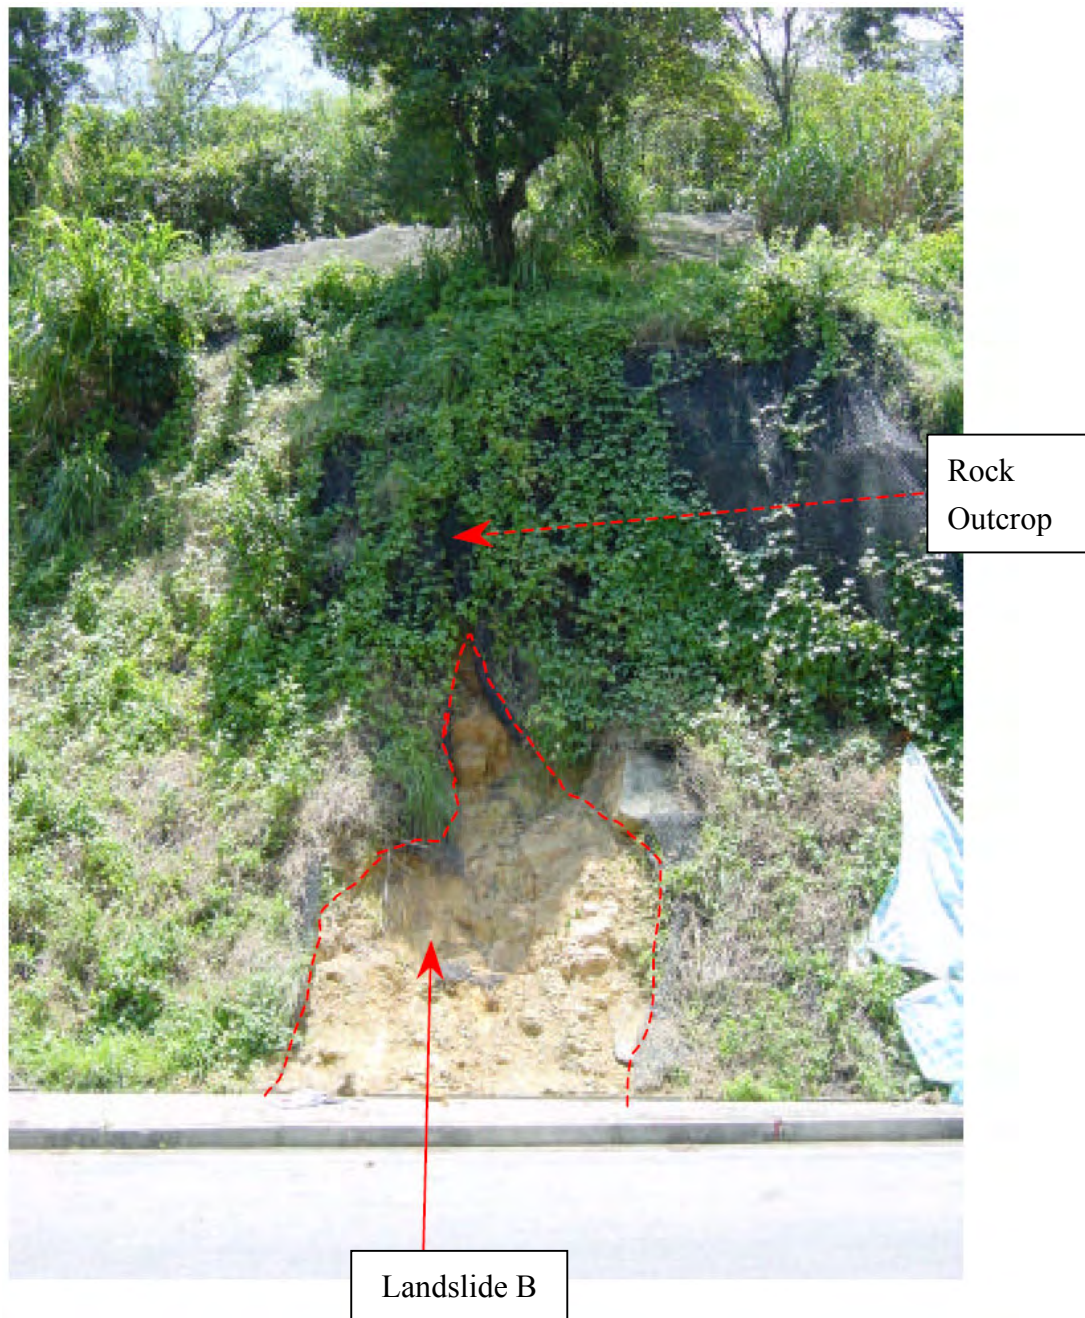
Elevation View of Landslide B on Slope No. 6SE-B/C4
